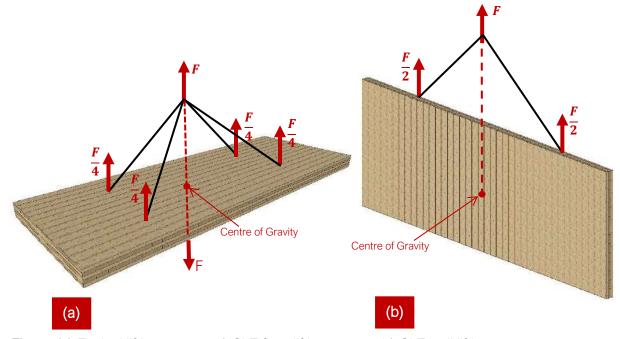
Typical lifting system; a) CLT floor lifting system, b) CLT wall lifting system.
